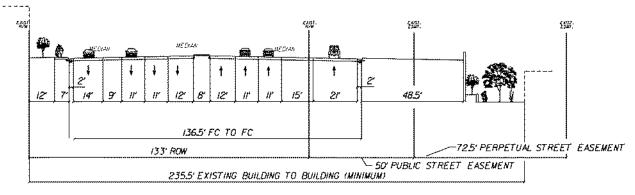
Existing Route 1 – Between 18th Street S and 15th Street S Cross Section (looking north)
